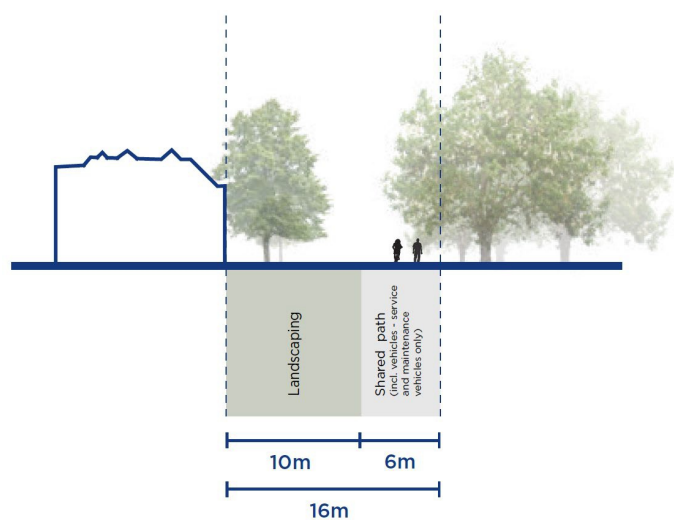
Typical cross-section 12, Cleveland Street connection to OSD deck
